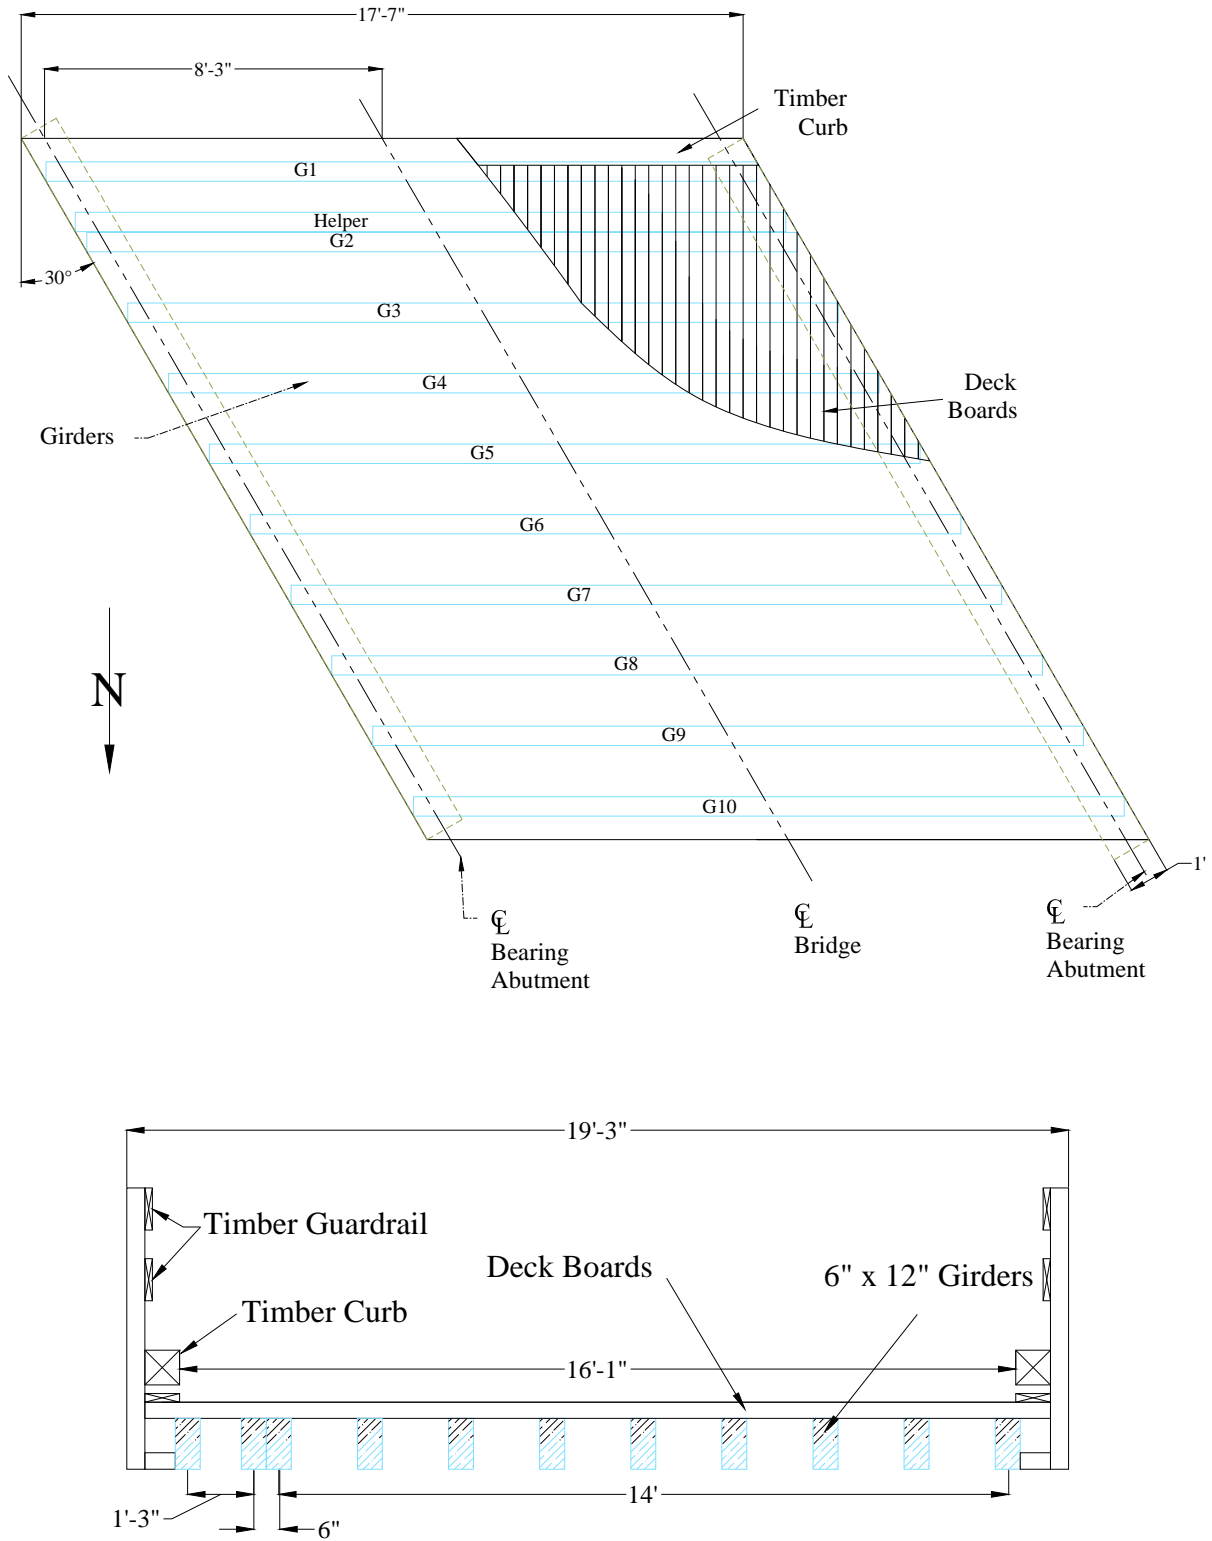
Plan and Profile Layout of Doebag Creek Bridge
